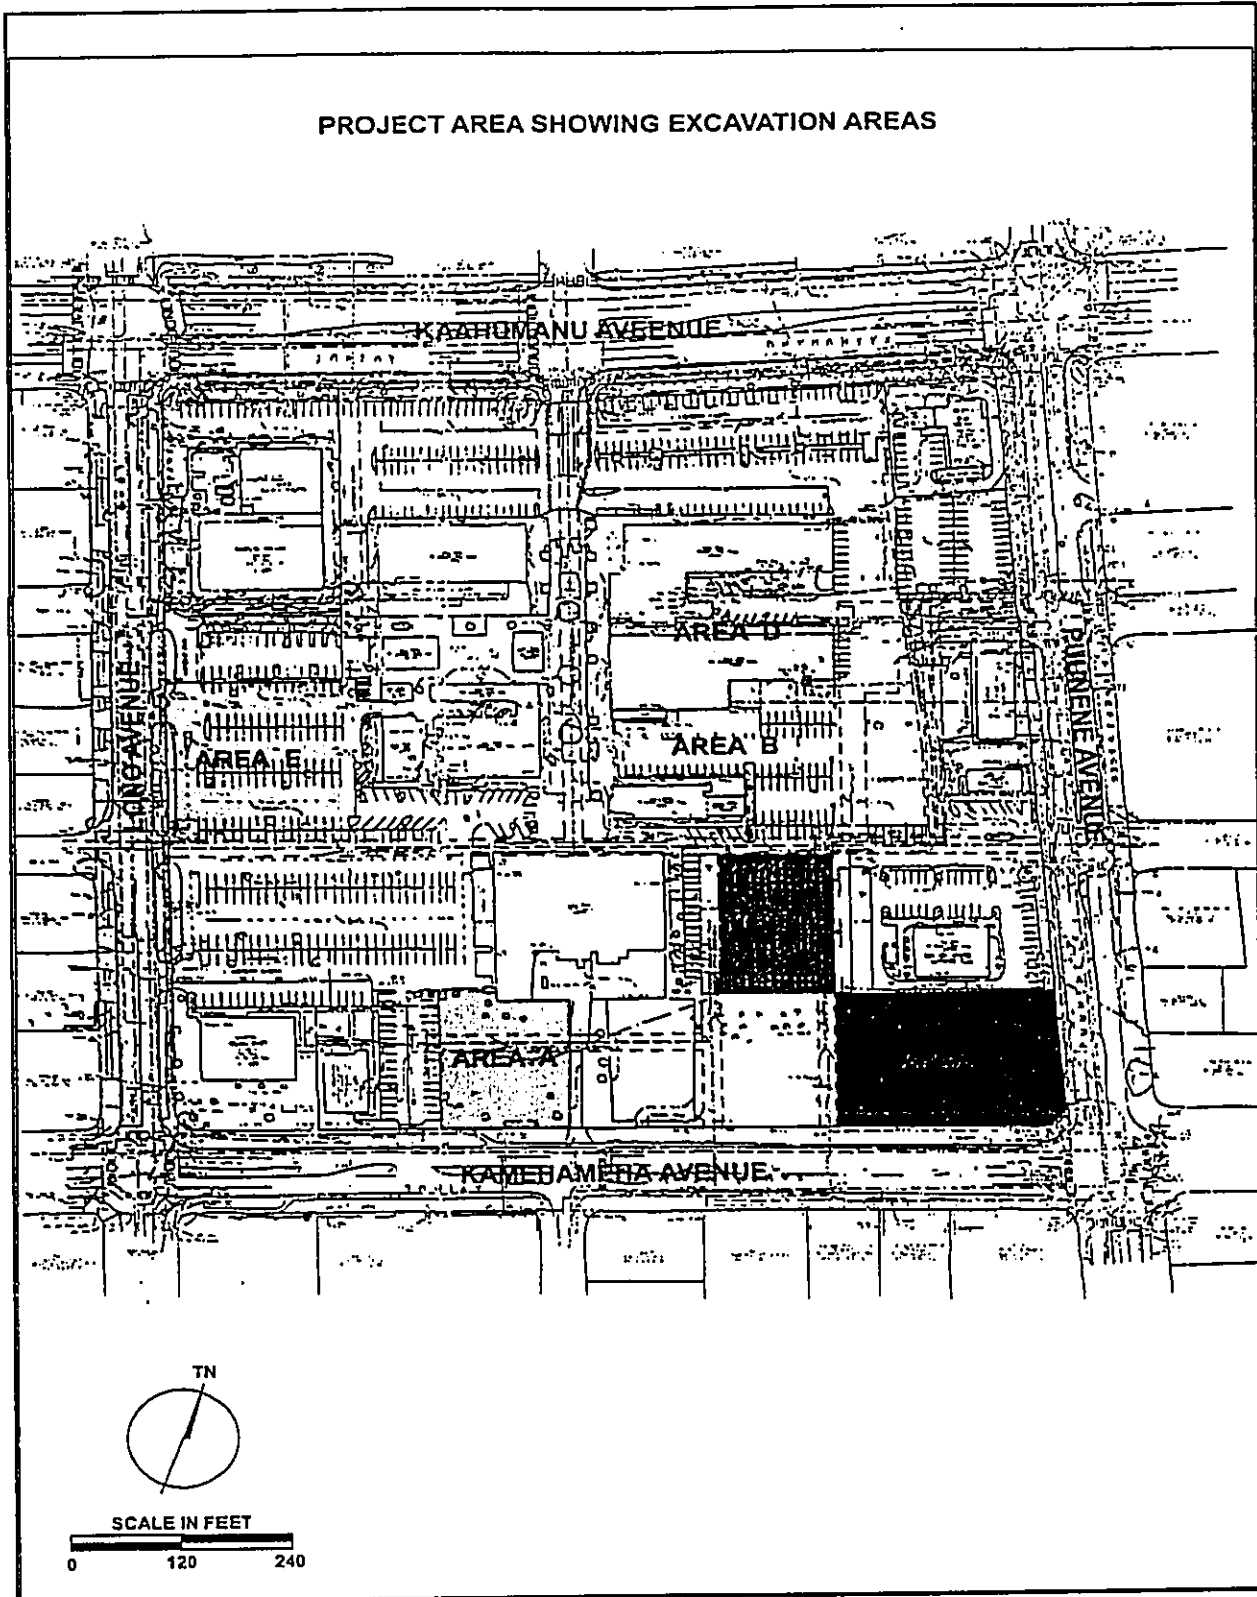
Project Area Plan View Map Showing Areas of Excavation.
